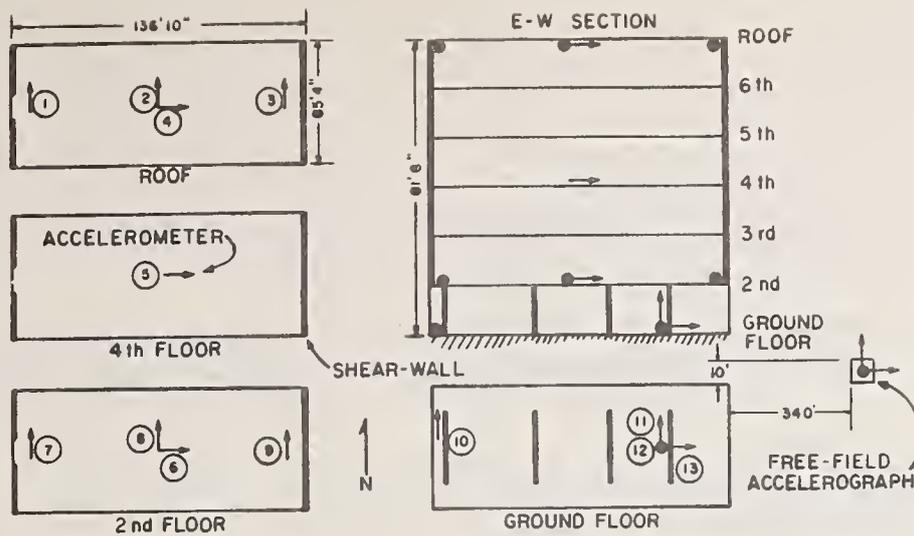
Floor plans and typical vertical section of the Imperial County Services Building. Locations of the sensors are identified.
